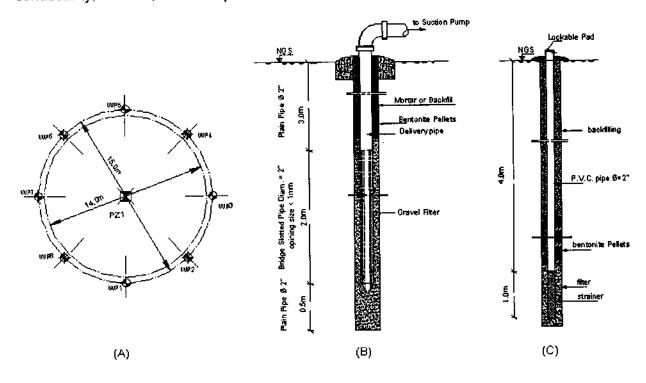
Site (D): Test Arrangement, Well and Piezometer Configurations
